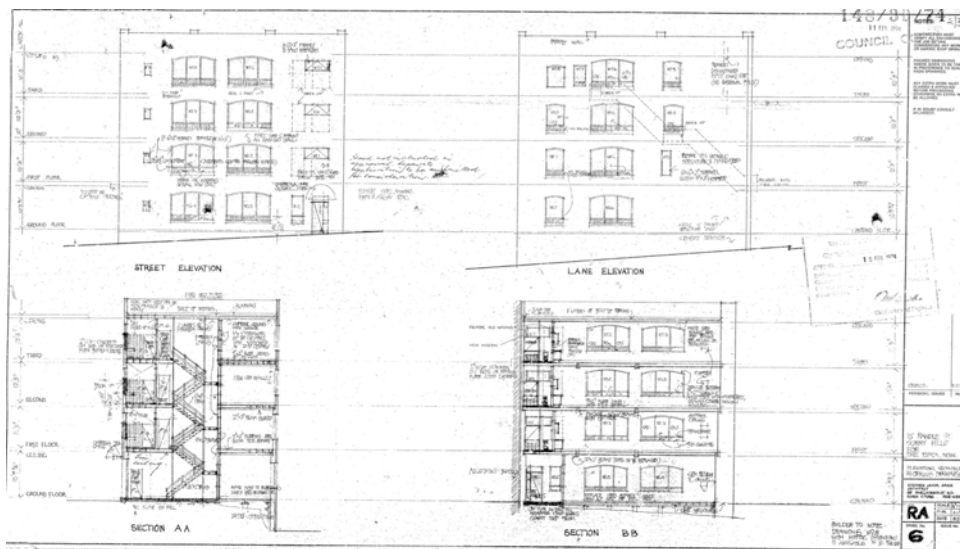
The building was badly damaged by fire in 1973 and was remediated the following year. That work was extensive. Elevations and sections by Stephen Javor. RAIA
